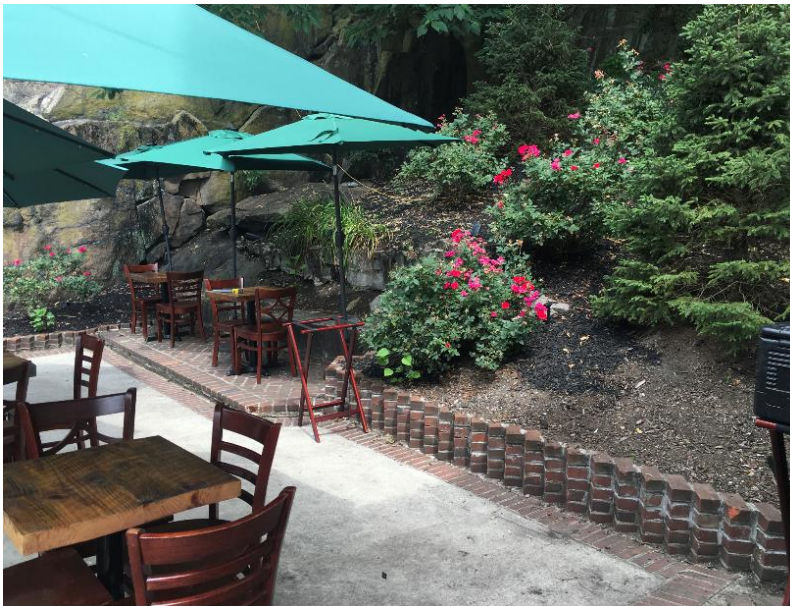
Photo taken July 2020. Low brick retaining wall to be removed.
